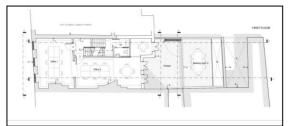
Proposed 1st floor plan of the permitted infill extension at no.14 Great James Street.
